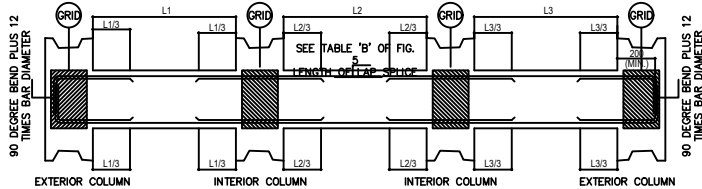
TYPICAL DETAIL OF GIRDER POST
